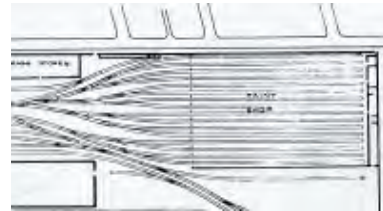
The Paint Shop at Crewe Works - a very similar arrangement to that at Eveleigh. Source: 'An Illustrated History of British Railways' Workshops' p 47.
